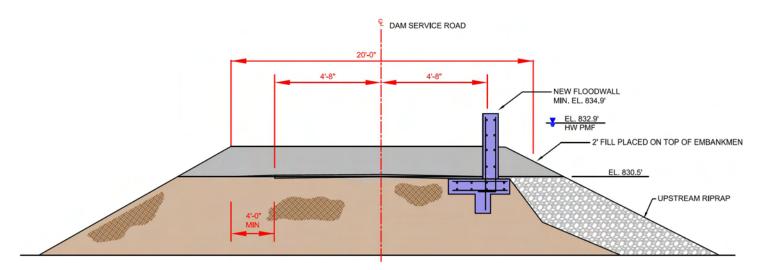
Tellico Dam – PMF Floodwall Concept for Segment T-2 (Main Embankment)
